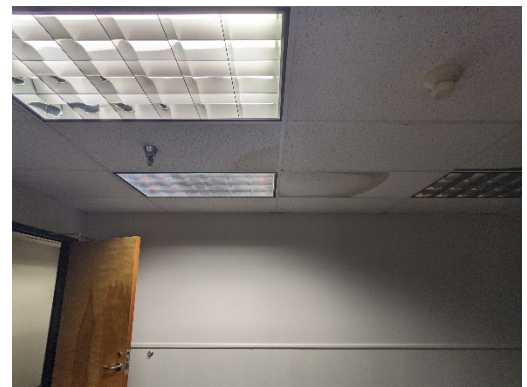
Water Stain on Floor and Ceiling in Toll Plaza A
